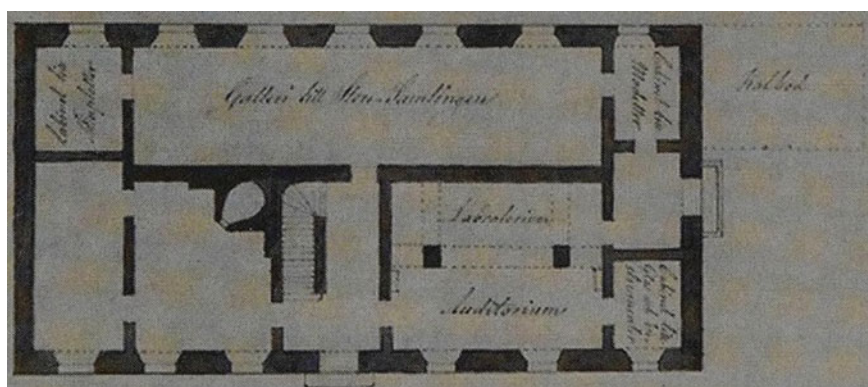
Torbern Bergman's chemistry laboratory building: floor plan
